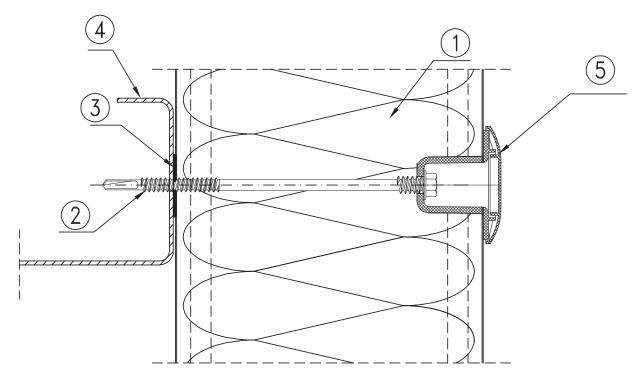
The fastening system for cold storage sandwich panels Balextherm-PU-F with the use of LAX anchors.
